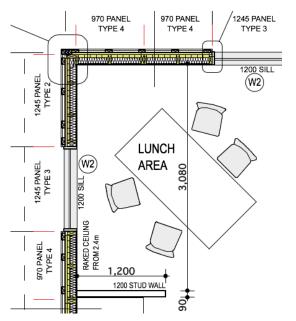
Section of floor plan detailing panel type and location with colour coding and notation.
